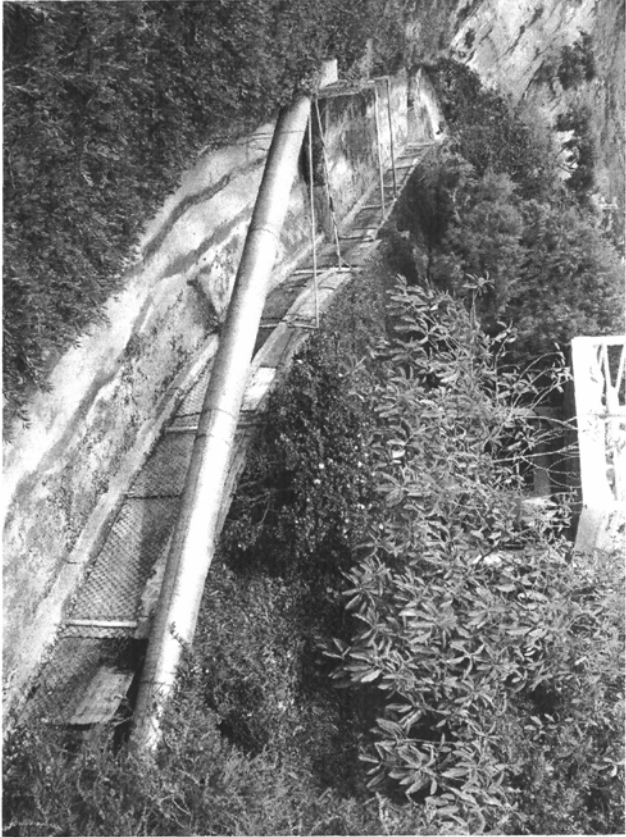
Looking upstream at drainage channel. Wall location would be behind channel on right side.
